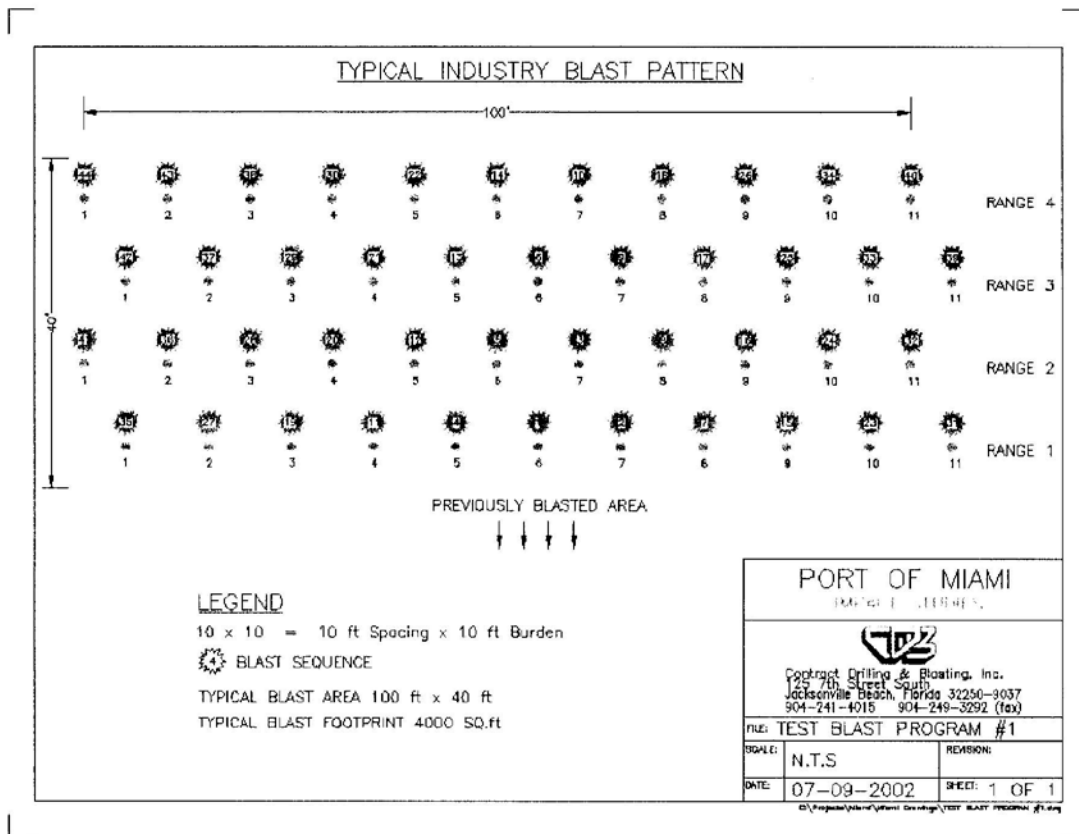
Typical blast array – 10 holes x 10 holes; 100 feet long by 40 feet wide. 4000 sq foot area per detonation,
